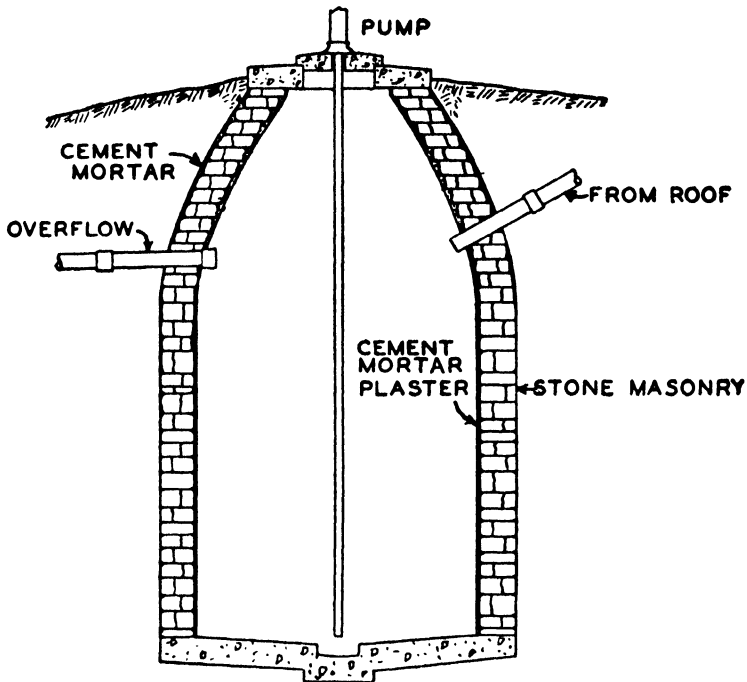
An underground cistern walled up with stone and mortar and plastered on the inside with cement mortar. It is also good practice to plaster the outside of the wall near the top to help keep out surface water. This type of cistern is suitable for use at a barn, or to supply soft water for the hot-water side of a plumbing system, provided it is filled only with clean water.
